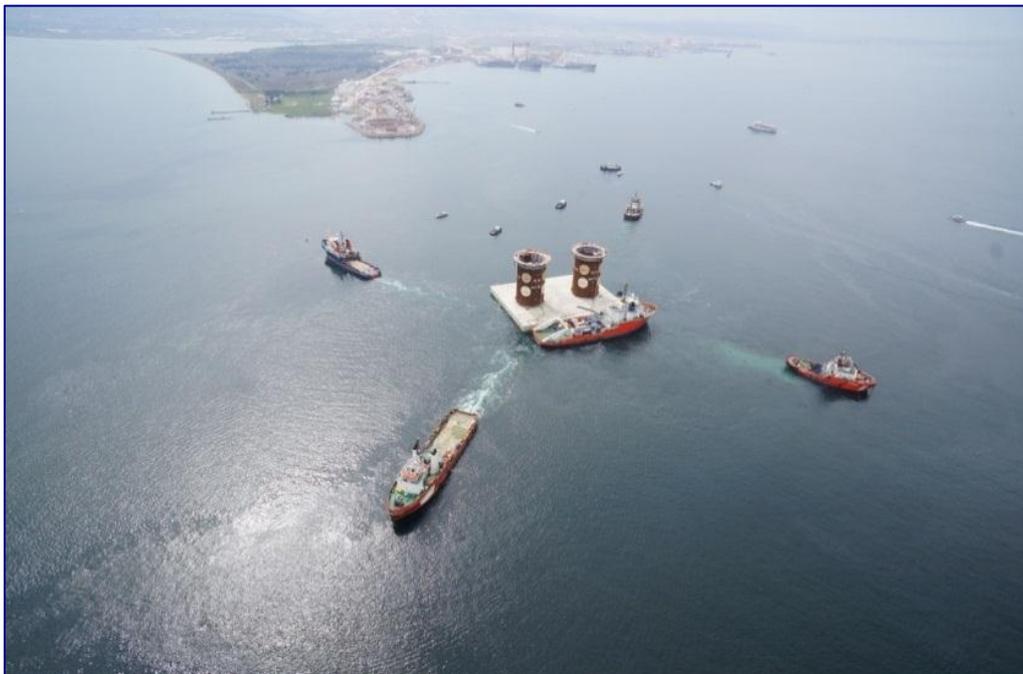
Submerging scheme for the Osmangazi Bridge south tower caisson foundation
